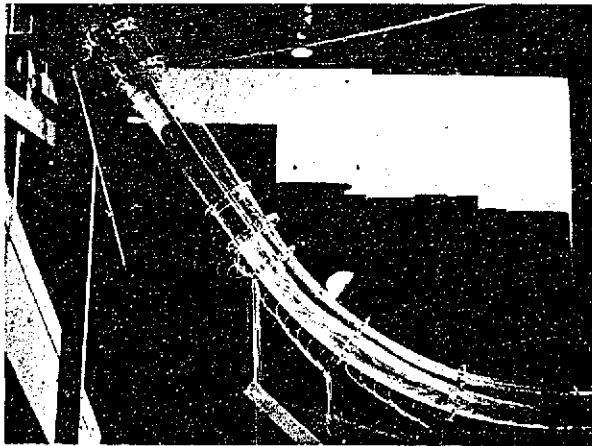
Overall spillway model—Recommended slot, Station 7+79— $Q = 50,000$ cfs—Air entrained at the aeration slot continues throughout the bend. Mixing tends to reduce the air near the flow surfaces in the downstream portion of the bend. (Note: Slot at Station 6+64, upper left, has been closed.) Photo P459-D-68808
